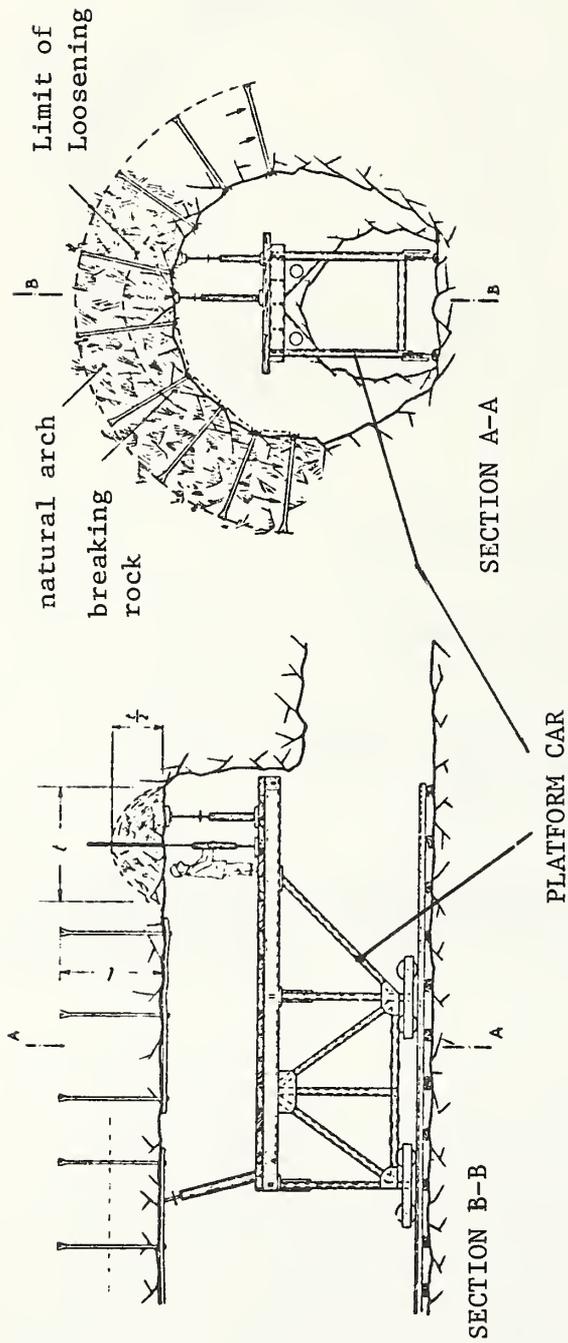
ROCK BOLTING OF THE CROWN FROM PLATFORMCAR (FROM DETZLHOFFER, 1960)
